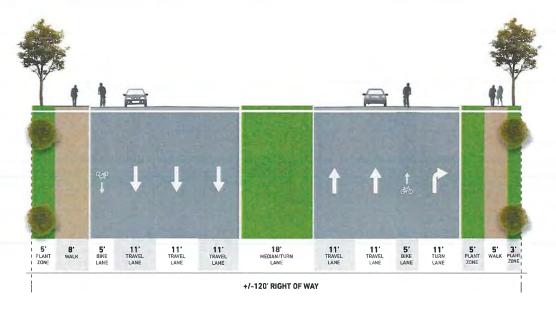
Typical Section (Norton Road to Hilliard Rome Road) on West Broad Street in the Western Gateway Sub-District
